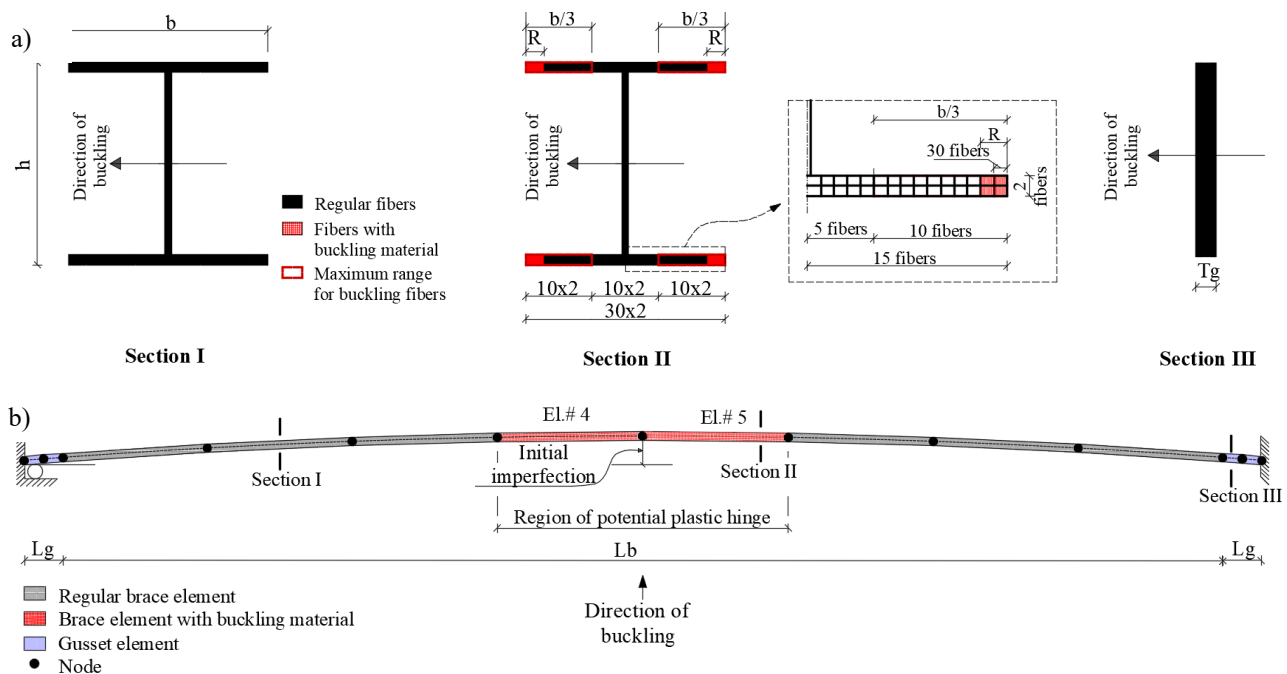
Brace modelling description. a) Fiber sections; b) Brace layout
